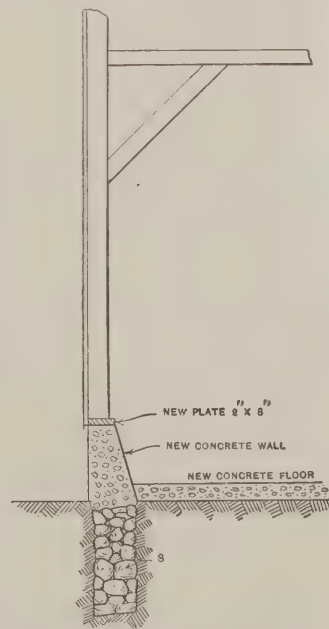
Appearance of Foundation and Floor When Repairs Are Completed.
